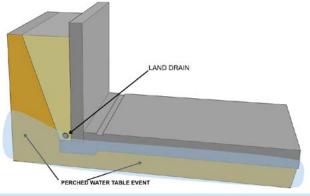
Often encountered detailed Agi-drain position with the wall/ slab juncture and toe remaining susceptible.
